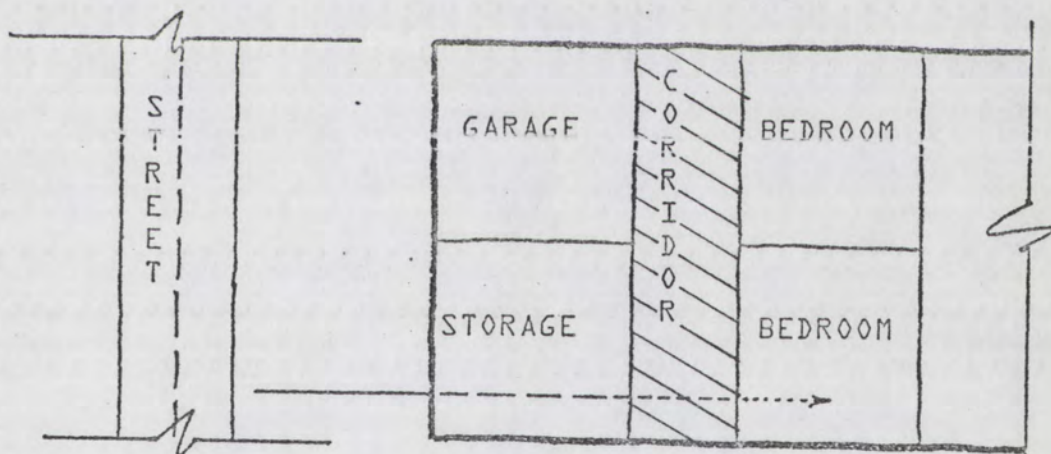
Spacial Requirements - Grouping Of Quiet Separated From Noisy Areas Through Floor Plan Design
